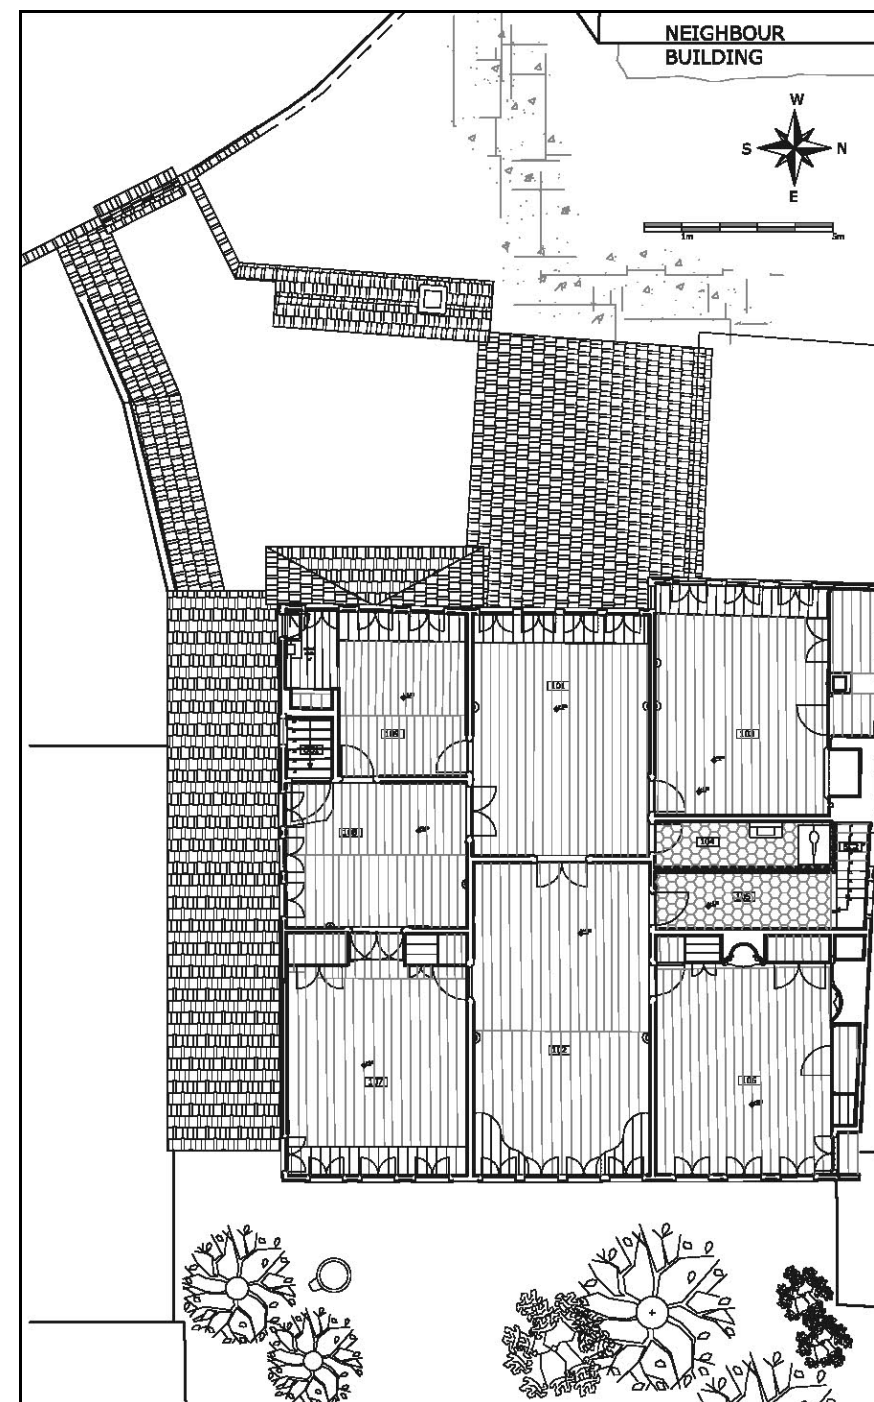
Restitution Phase II – First Floor Plan: 1/200 (Presented in 1/100 at Jury)
